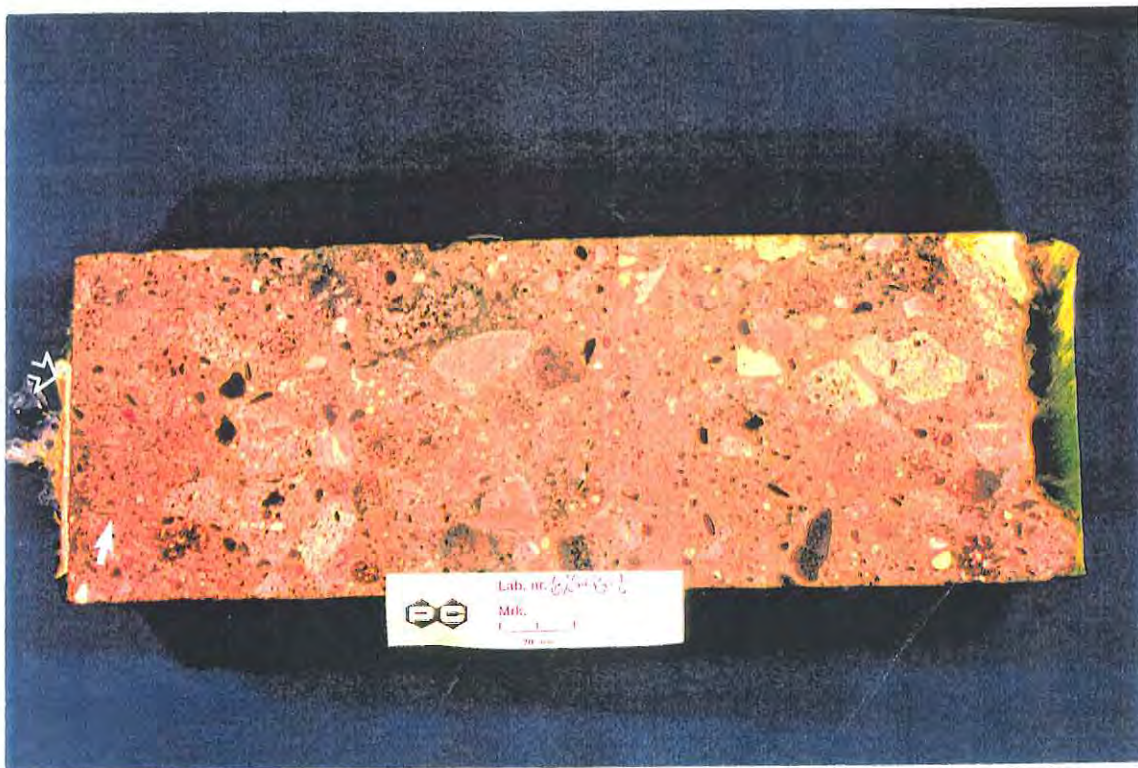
Photo of Pier 39 sample with epoxy layer present at the surface (see open arrow). The layer does not penetrate the concrete. A surface crack is present (see closed arrow).
